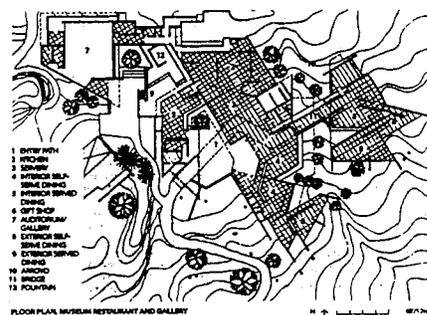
Arizona Sonoran Desert Museum Restaurant Floor plan. Courtesy of Line and Space.
